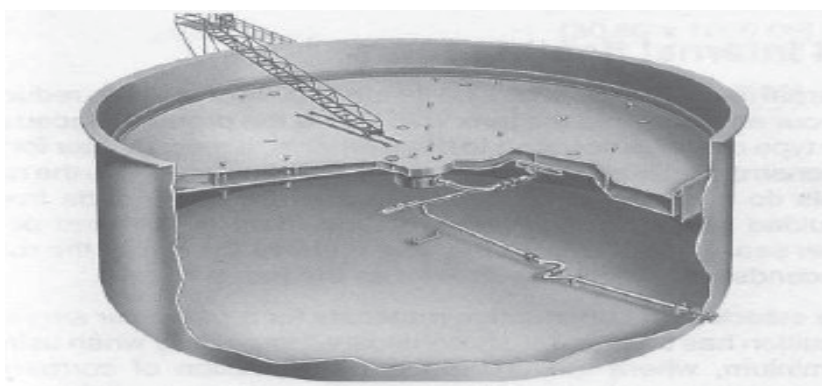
Double Deck Type Floating Roof [Bob. L & Bob. G, n.d, p.155]
